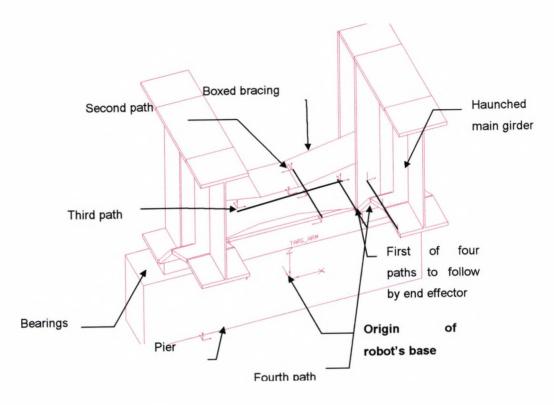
Bridge Detail [C3] according to Table 4.3
